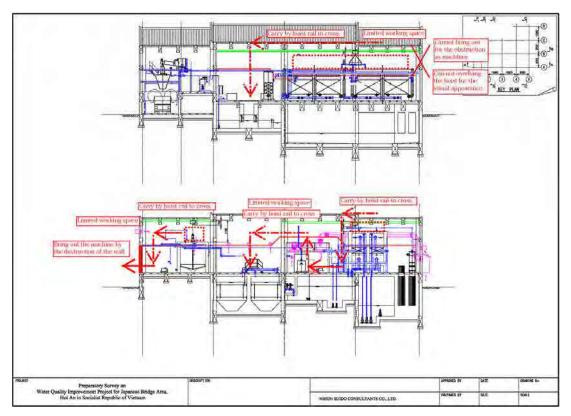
Transportation Route in the Case of Reinforced Concrete (Cross Section 1)
